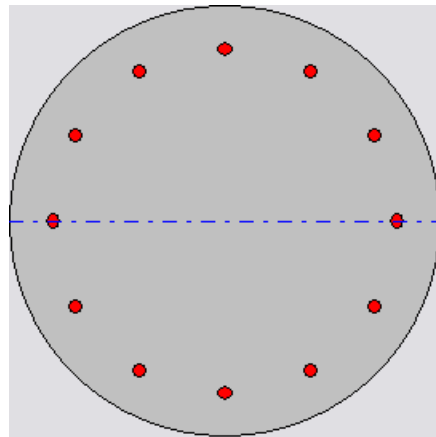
Cross-section of Drilled Shaft for Example 2.
